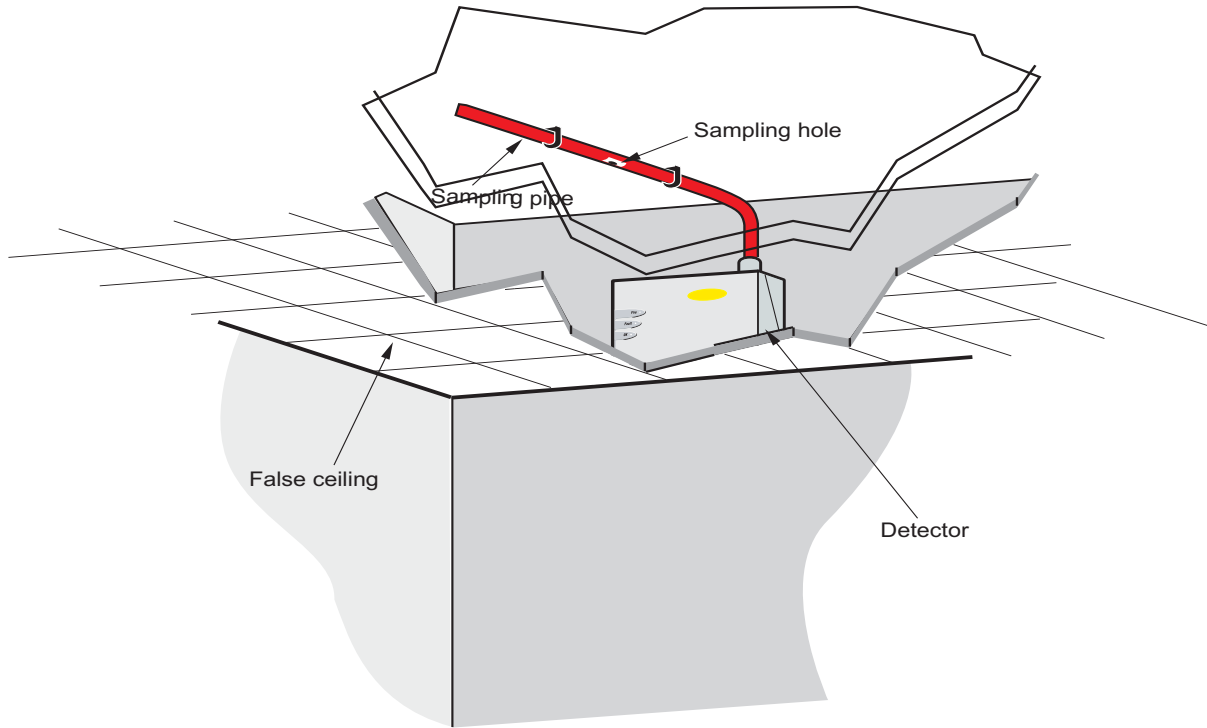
Installation of Pipework Above Ceiling with Detector Mounted in Ceiling Void (No Exhaust Piping)
